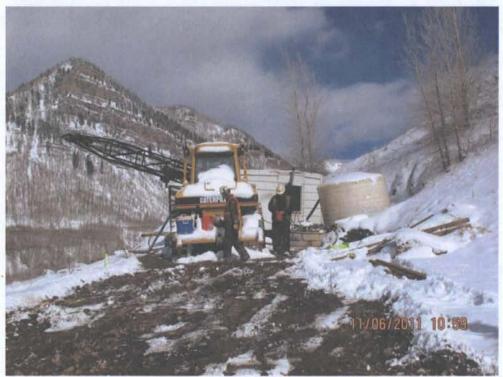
View north showing drilling set-up at Drill Hole BAH-01
